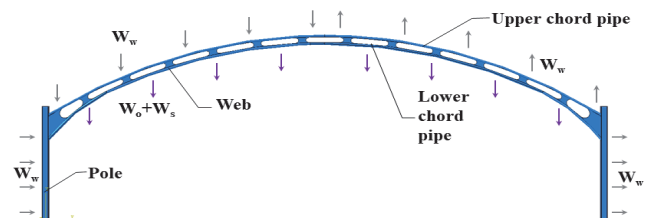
Schematic diagram and loading conditions of the new type soundproof tunnel girder
